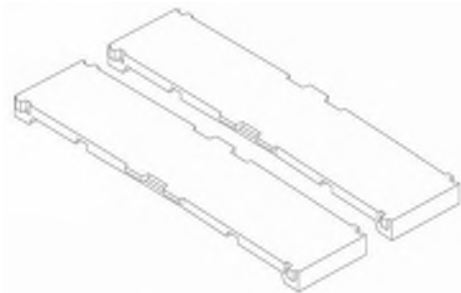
3D-sketch of two elements, illustrating the joint. Figure 2 – Element during assembly
